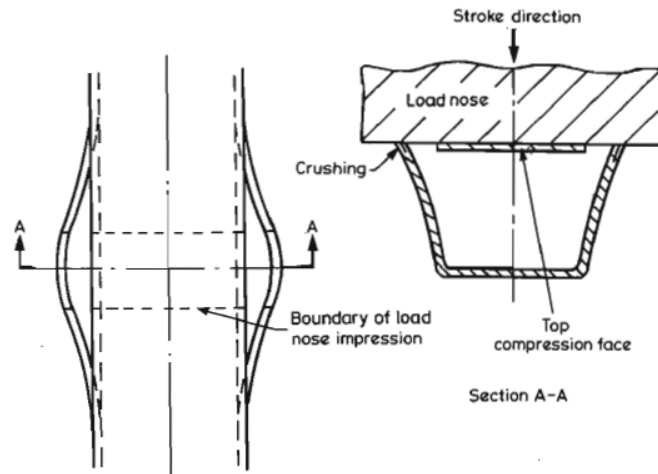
Failure mode of box section when span is short and wall thickness is ‘thin’ (Mottam, 1991)
